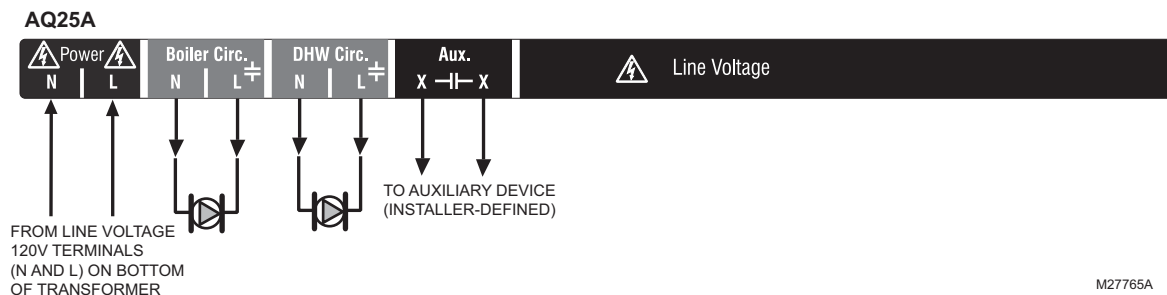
Wiring for Boiler Pump, DHW Device, and Aux Output.
